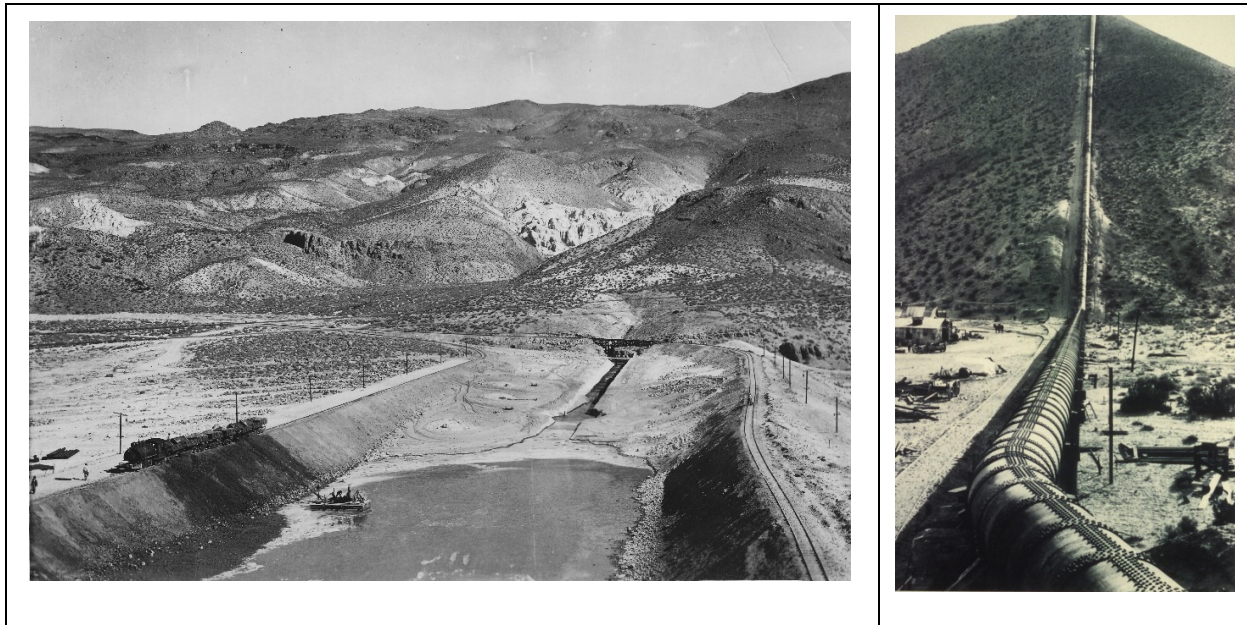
Left view shows Haiwee Dam under construction in 1911. All of Mulholland's embankment dams utilized hydraulic filling and puddling techniques, shown here. Right image shows the Sag Pipe crossing Jawbone Canyon, dropping and rising 850 feet (LADWP Archives).
